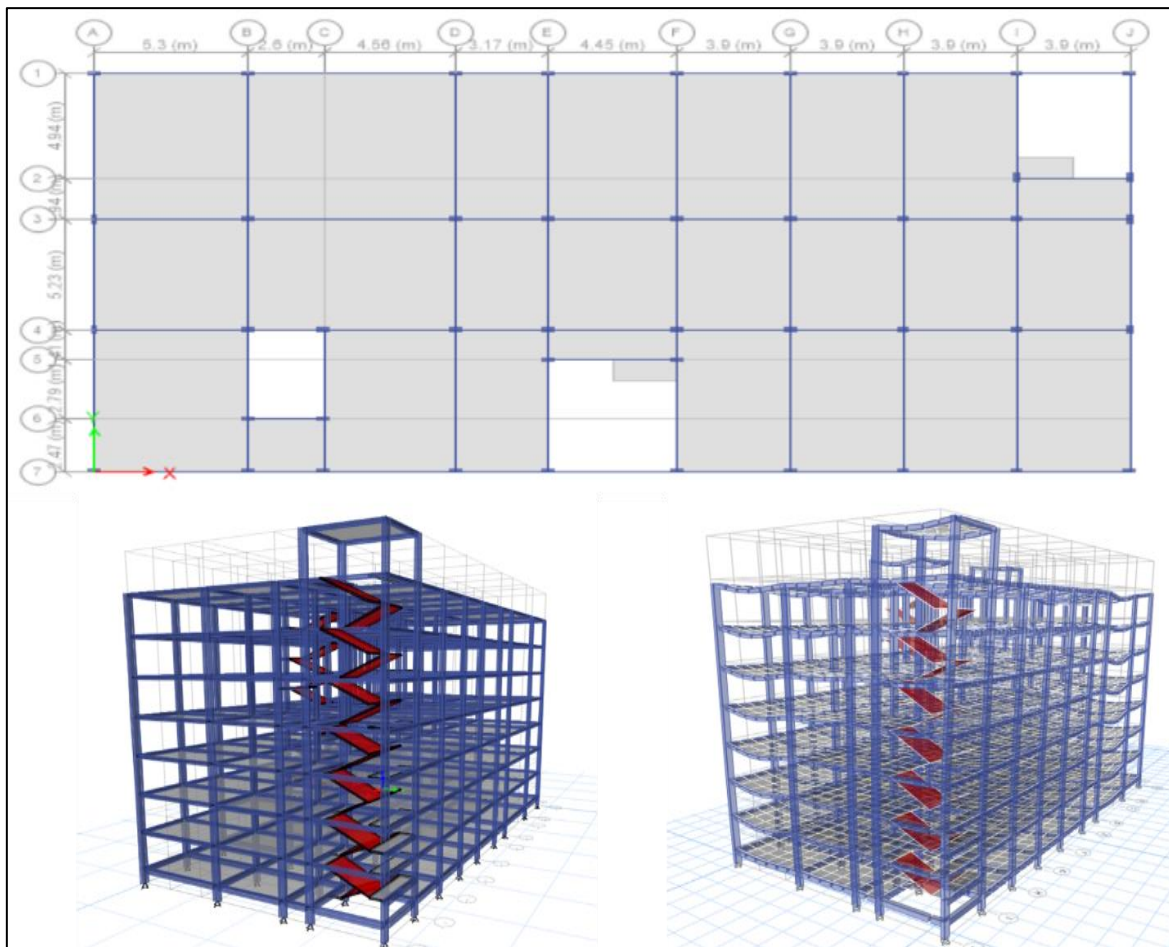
Plan, 3D View & 3D Analysis Model of the Building
